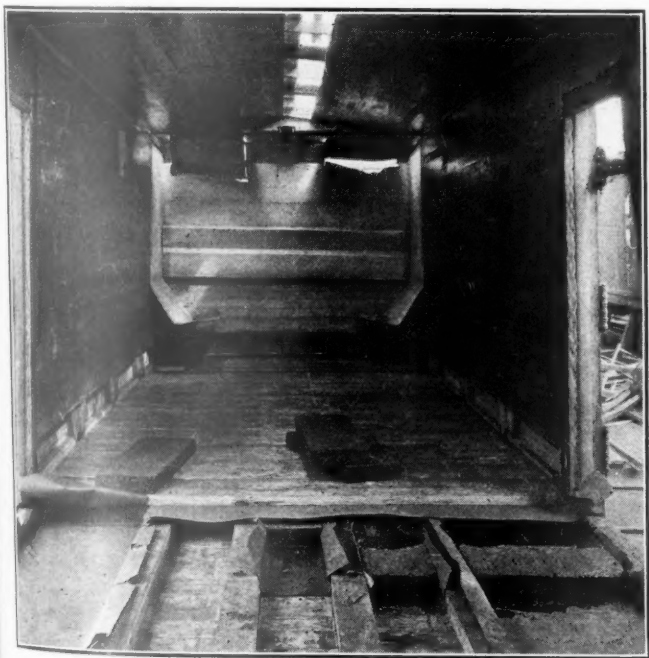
Method of Applying Insulation and Waterproofing in Floor
